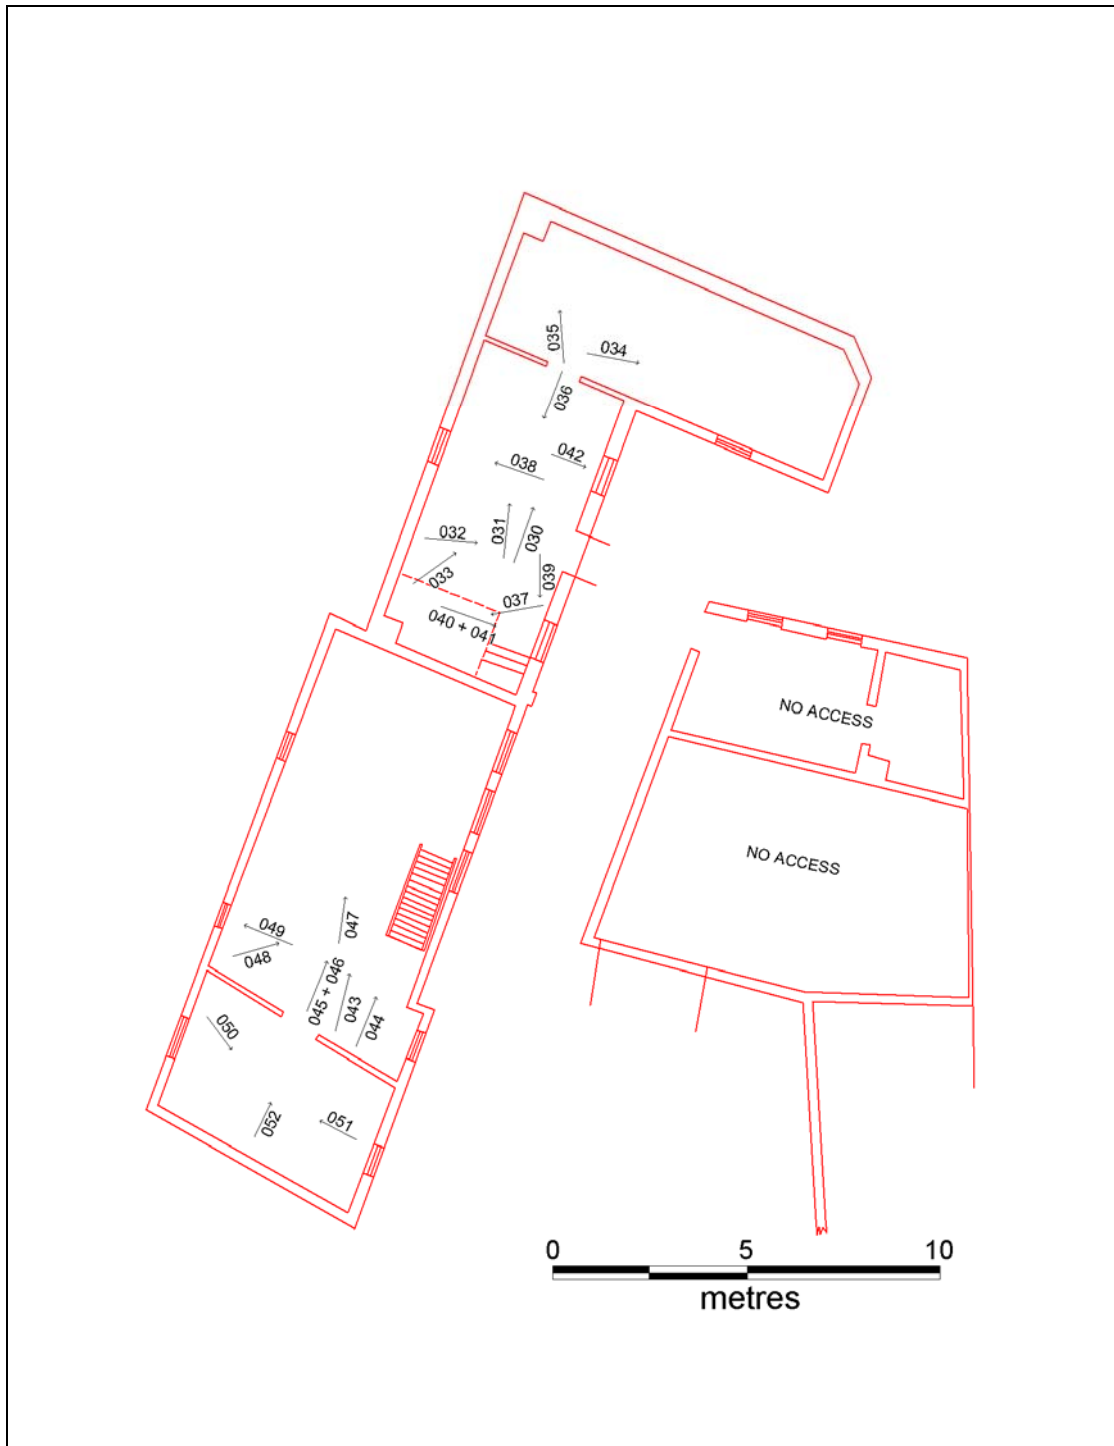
Plan of Upper Floor showing direction and approximate location of camera (photographs 30-52)
